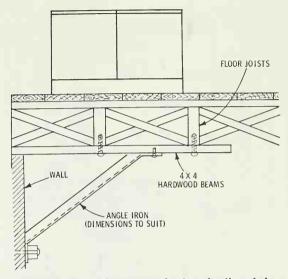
An alternate method of strengthening the floor below a washingmachine installation.
